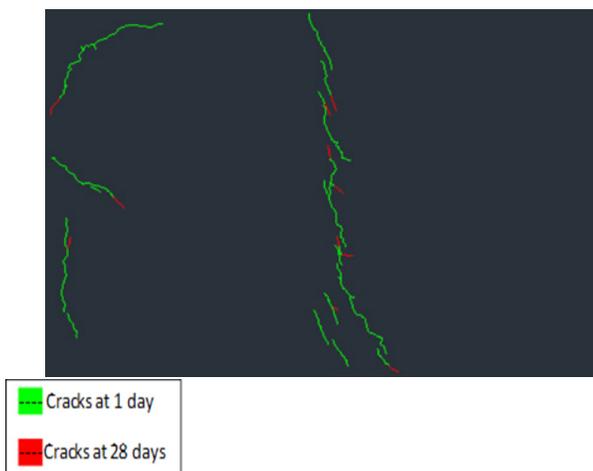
Auto CAD image of Shrinkage cracks – PFSCC50 mix
